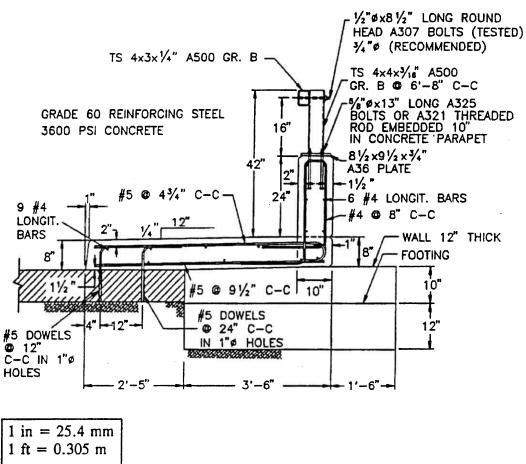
BR27C Bridge Railing with Sidewalk (8,40,42).
